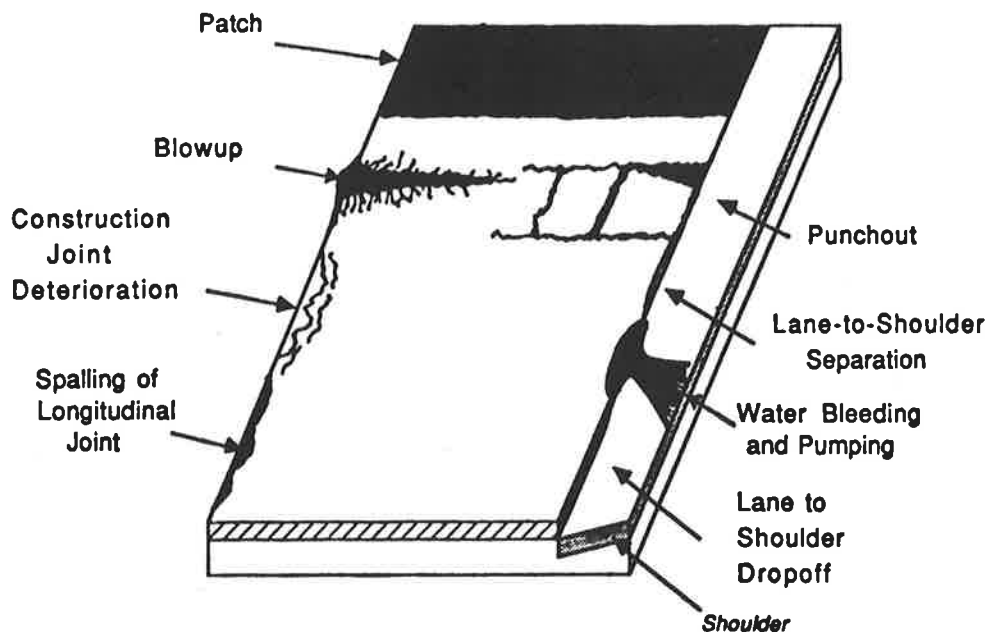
Miscellaneous defects of continuously reinforced concrete pavement
